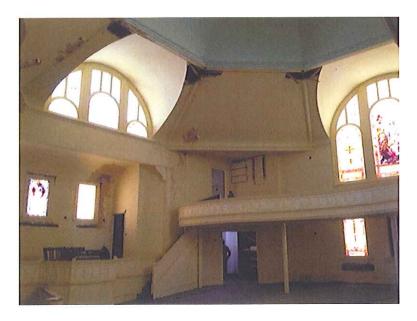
South Wall Interior Showing Deteriorated Brick Masonry Veneer
